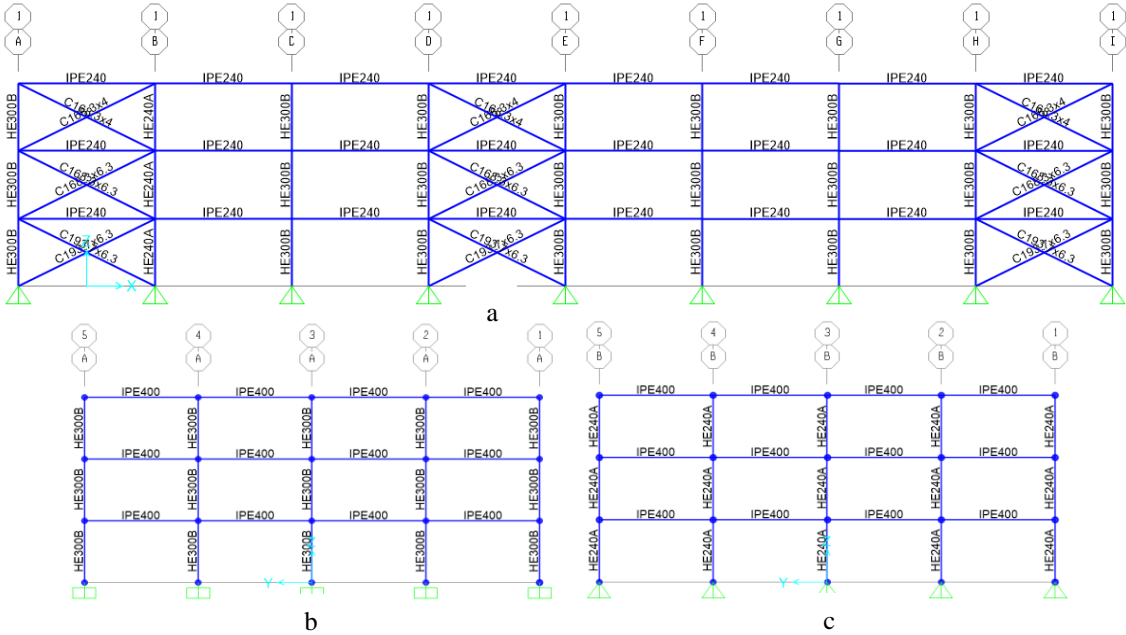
Framing member profiles for a) longitudinal frame b) moment resisting frames c) gravity frames
